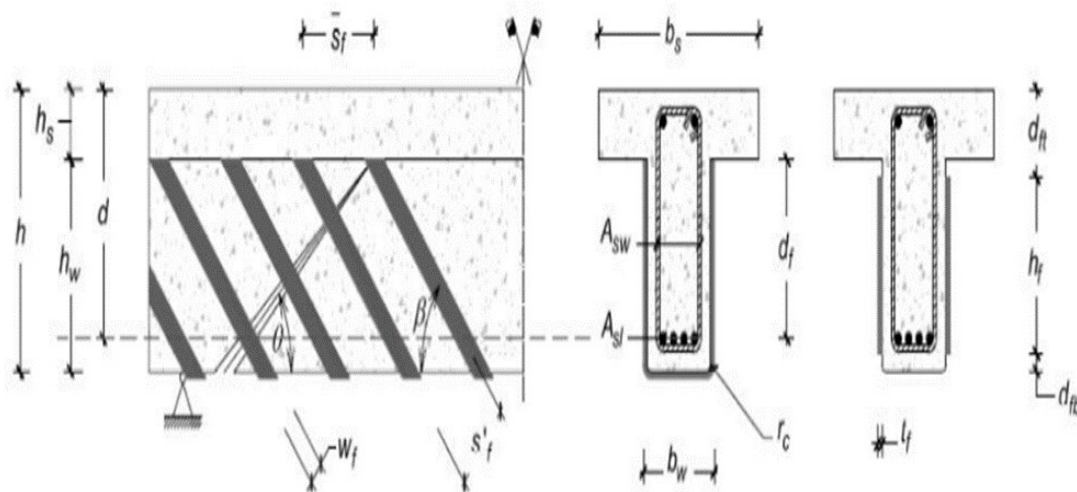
geometric properties of FRP shear reinforcement (ACI:440-2R)
